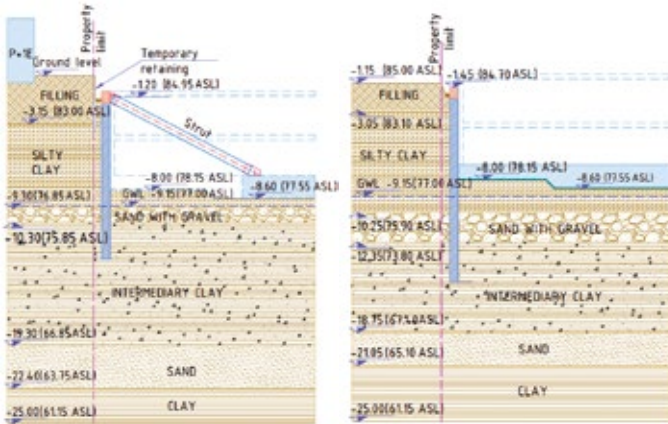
Characteristic sections: left – wall supported by struts – S3 and S4, right – self-supported wall - S10
